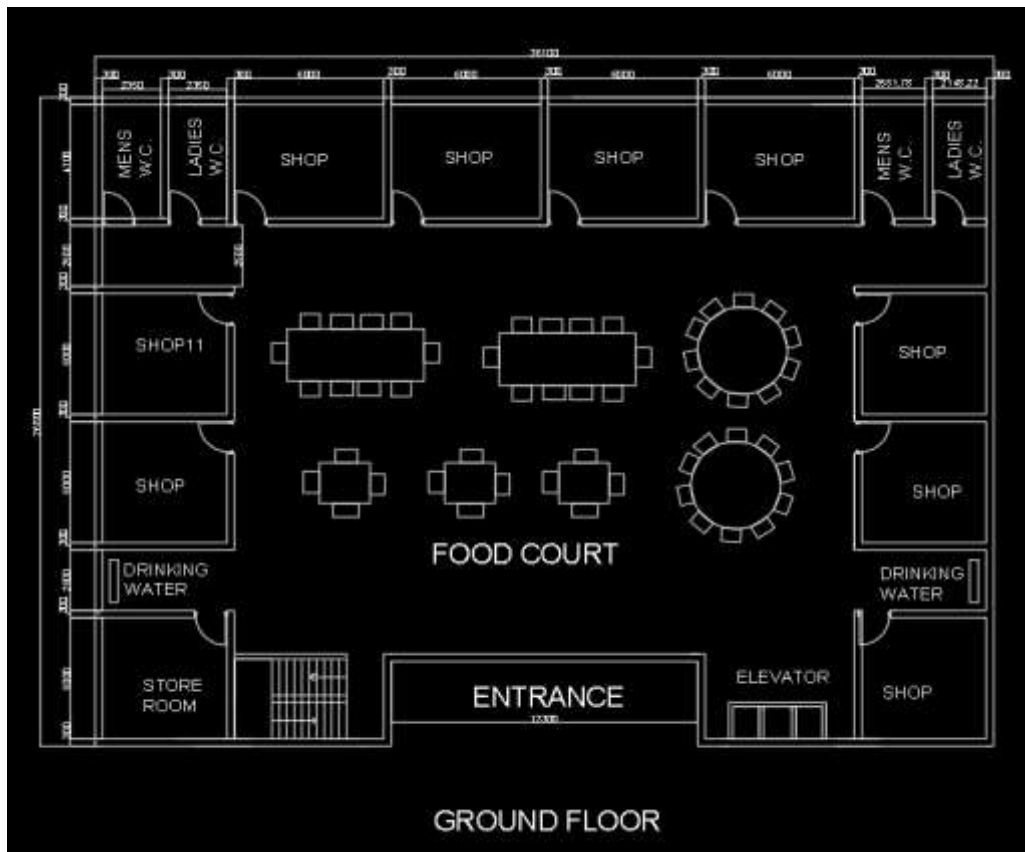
Plan of Ground Floor Building (all dimensions in mm)
